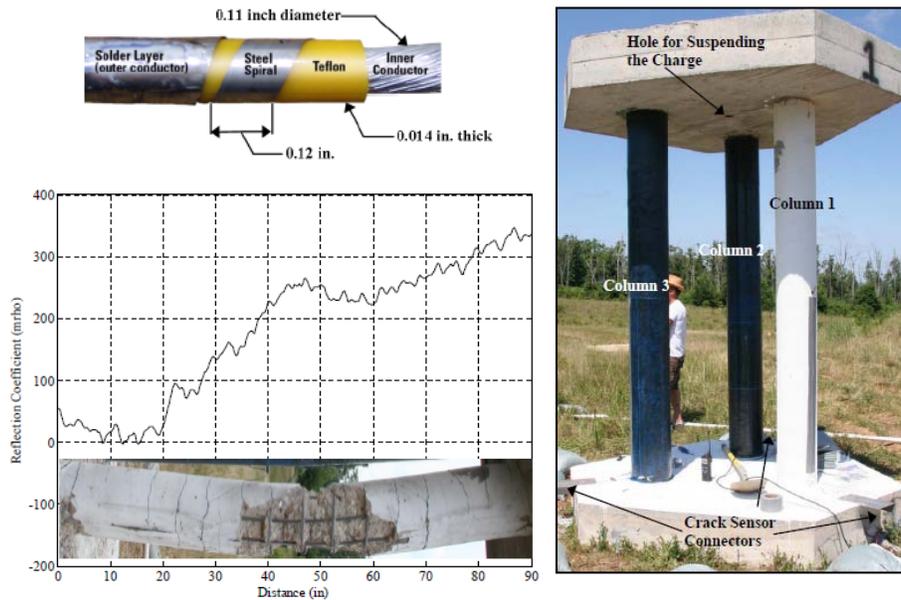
Cable sensor (top left) used with ETDR measurement for detecting damage to concrete columns subjected to blast loads (right). Example test results superimposed on damaged column (bottom left).
